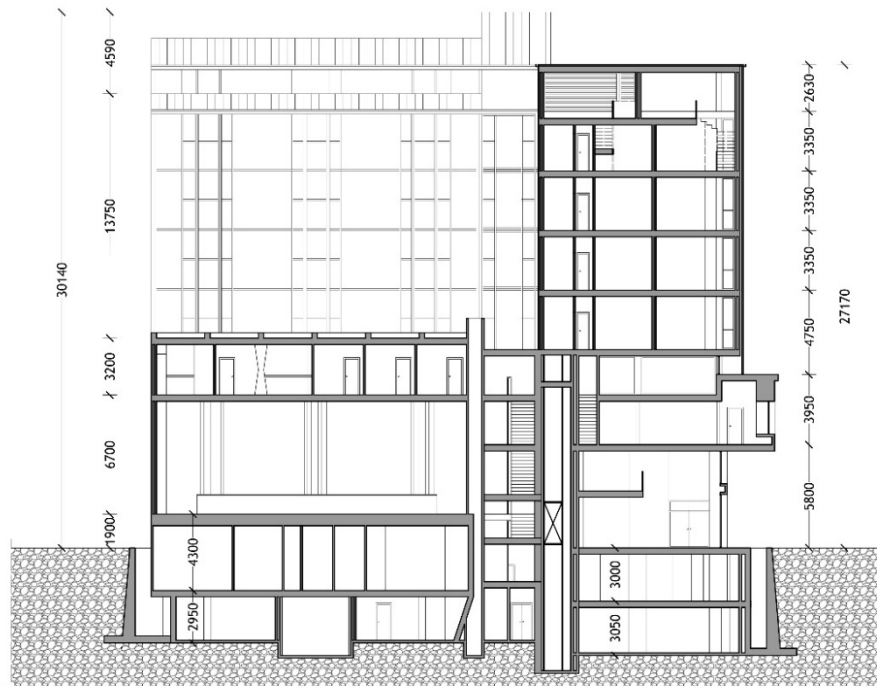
Vertical section of the building denoted as A-A in the structural plans
